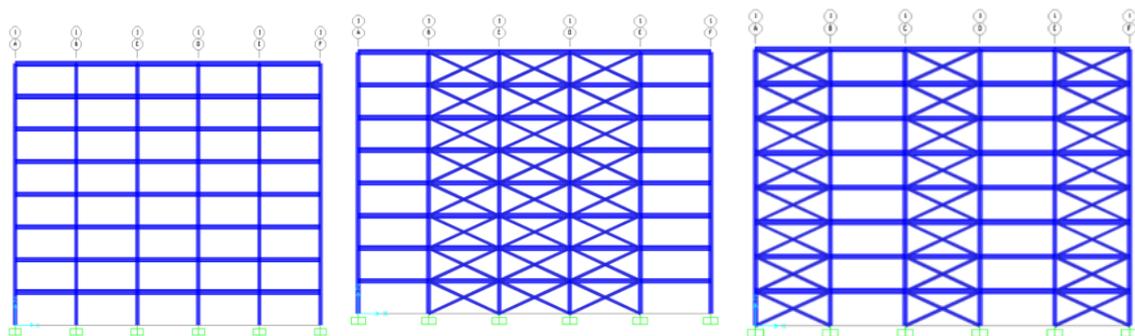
2D models of 1) Building without bracing. 2) Building with X bracing with neighbor arrangement. 3) Building with X bracing with alternate arrangement.
